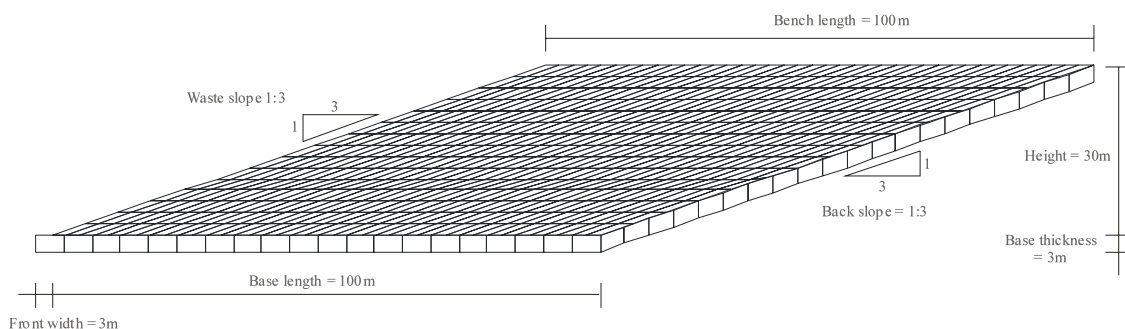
FLAC mesh layout and geometry for a cross-section through a typical liner and waste configuration
